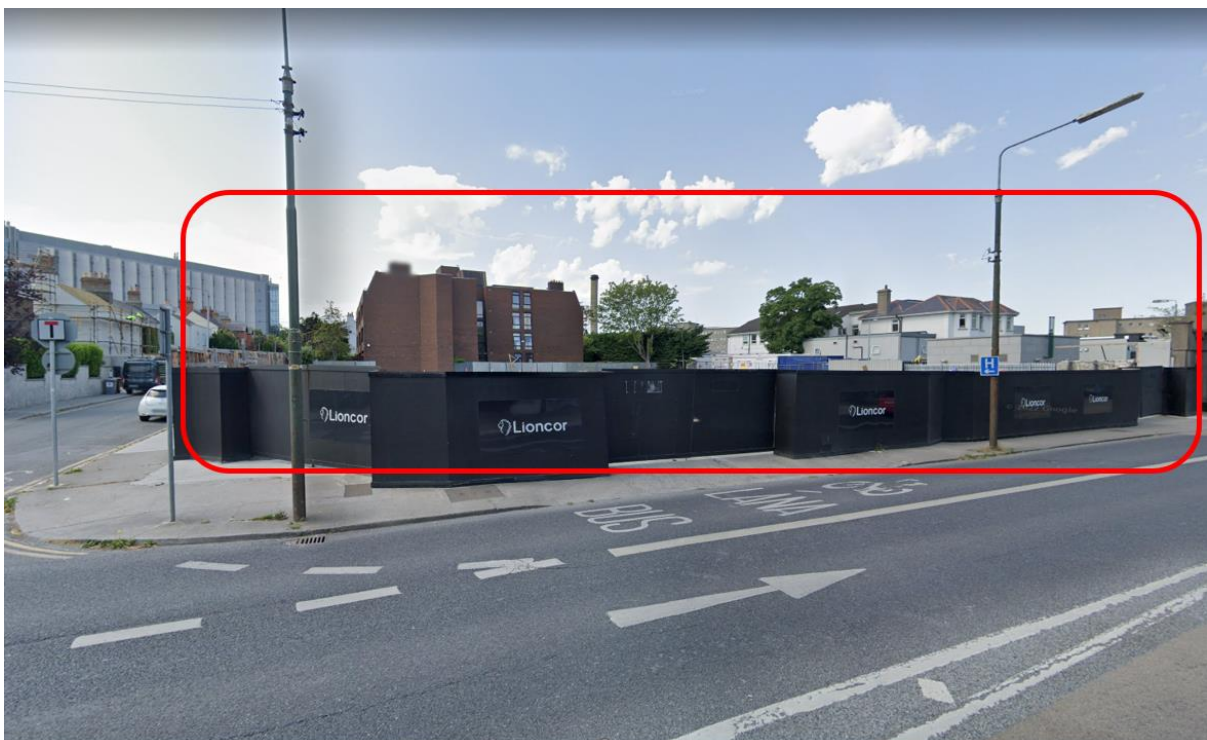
Existing Street View of 133-145 Merrion Road (Image Source: Google)
